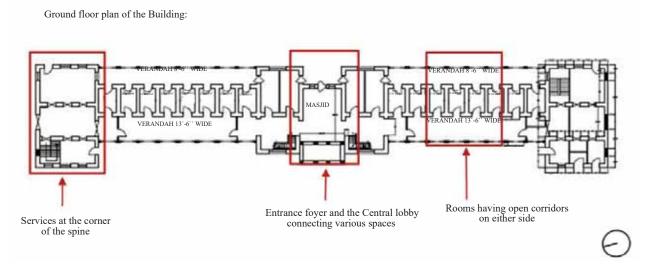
Plan of the hostel building showing internal layout of the spaces—Year 2017 Source: Drawing - Antiquities Department – Government of Sindh – Year 2011
